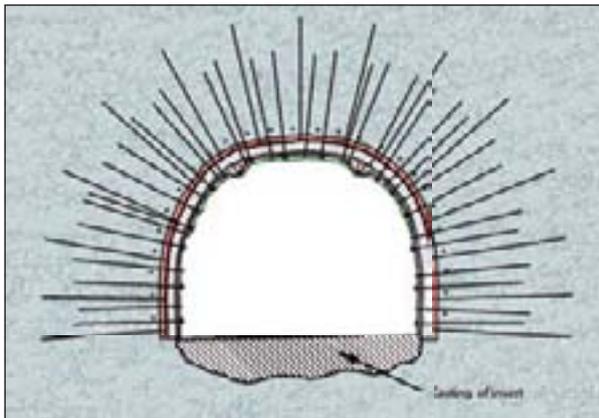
Permanent stability protection using sprayed concrete and reinforced sprayed concrete ribs
